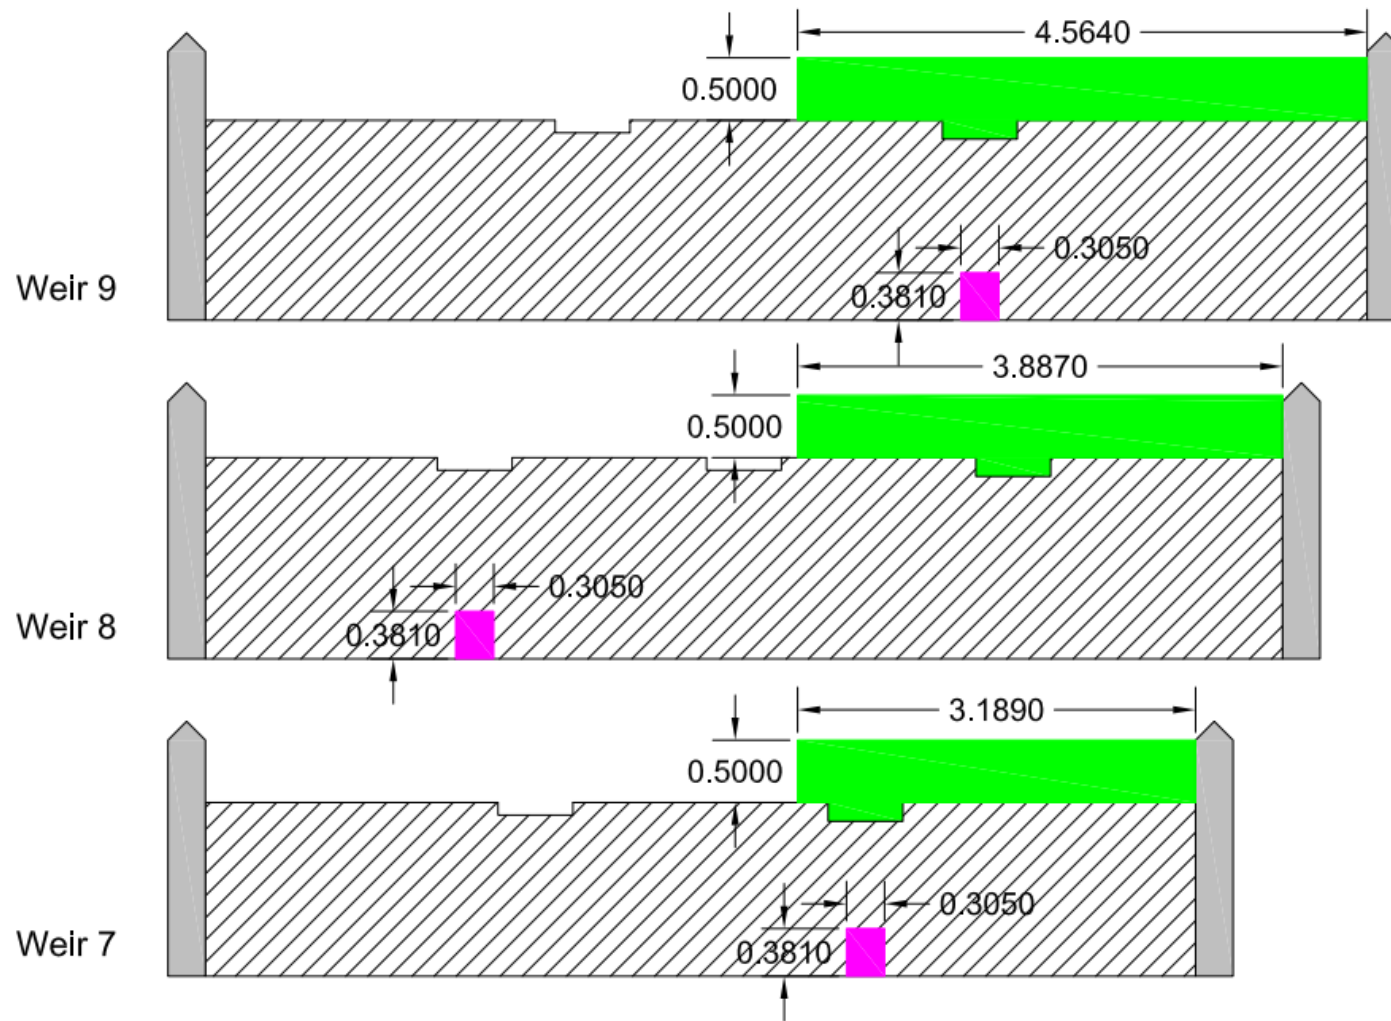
Weir 7, 8 and 9 details (looking upstream).
